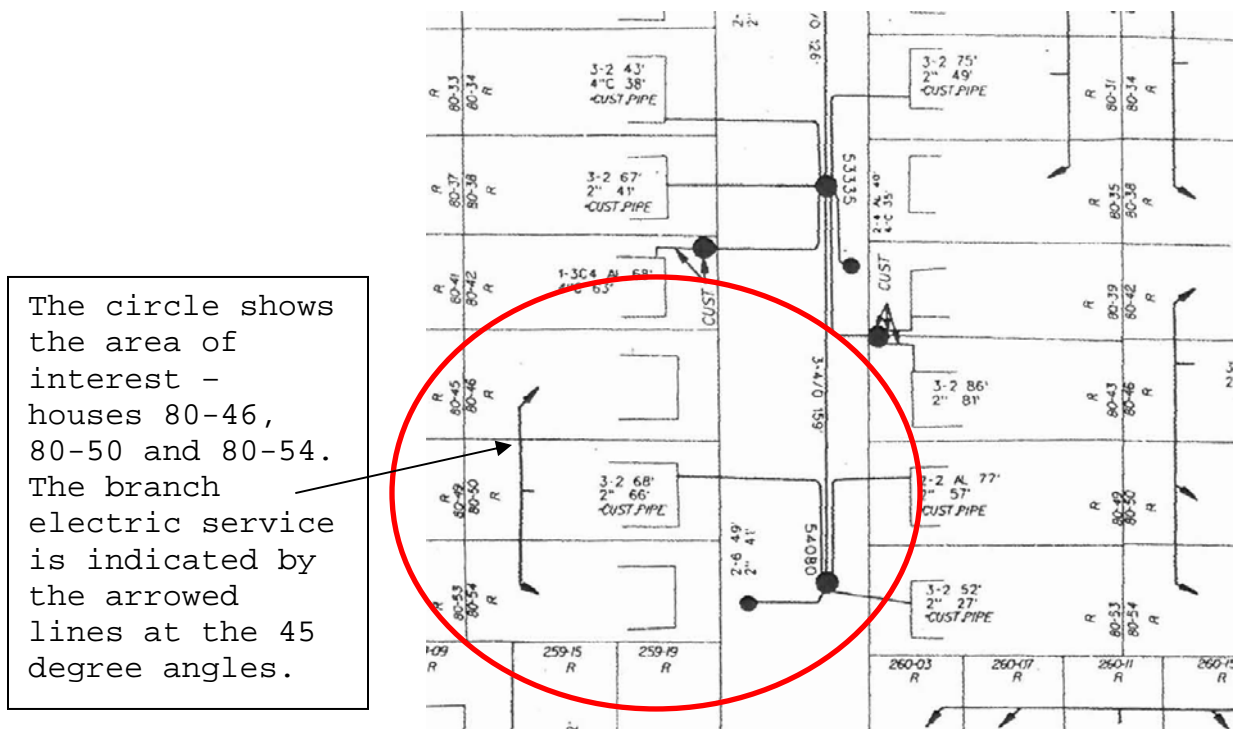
Byers Image of Electric Facilities on 260<sup>th</sup> Street
